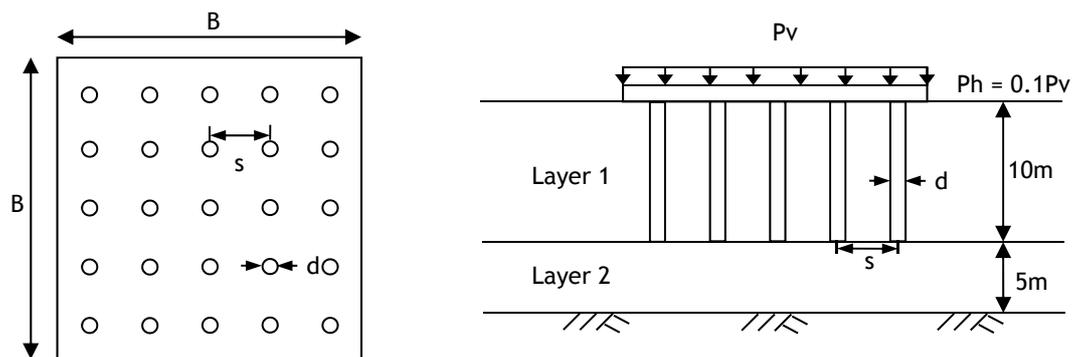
Typical Foundation Layout Embedded in Two Layered Soil Model
